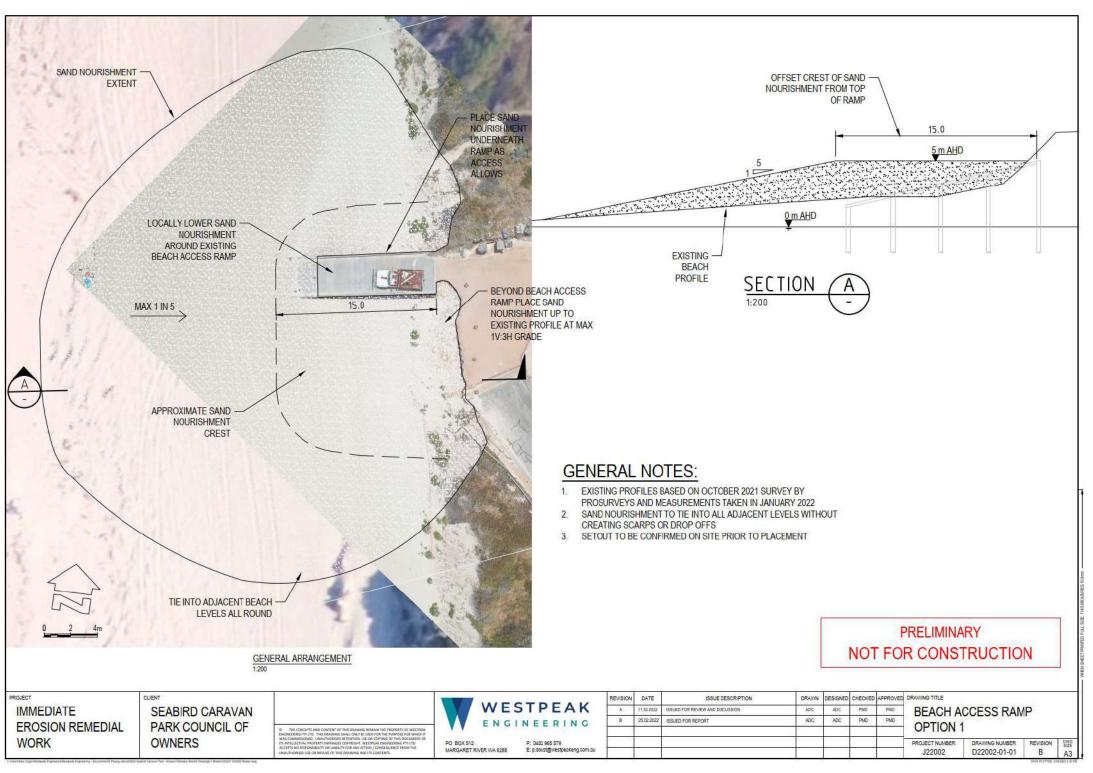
Beach Access Ramp Option 1 – Sand Nourishment
